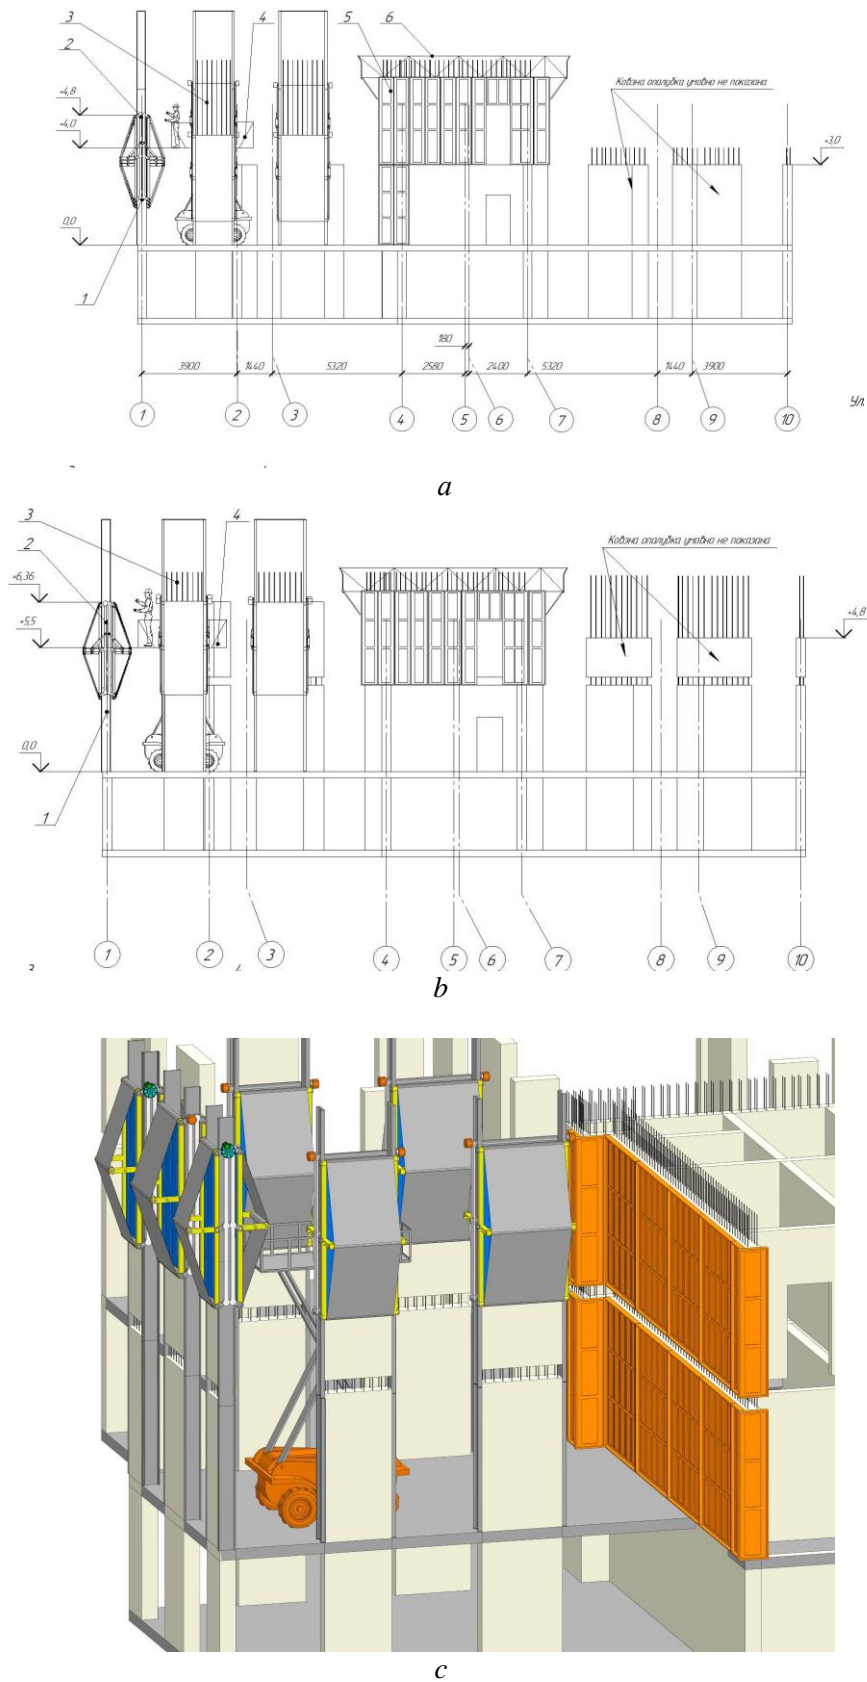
Scheme of erection of vertical monolithic structures using mobile formwork: 1 – pylon of the building; 2 – movable formwork; 3 – reinforcement; 4 – mobile assembly platform; 5 – panel formwork; 6 – subflooring; *a* – moving formwork equipment to a height of 3.0 to 4.8 m; *b* - I stage of concreting from 3.0 to 4.8 m; *c* - II stage of concreting from 4.8 to 6.4 m 3D model
